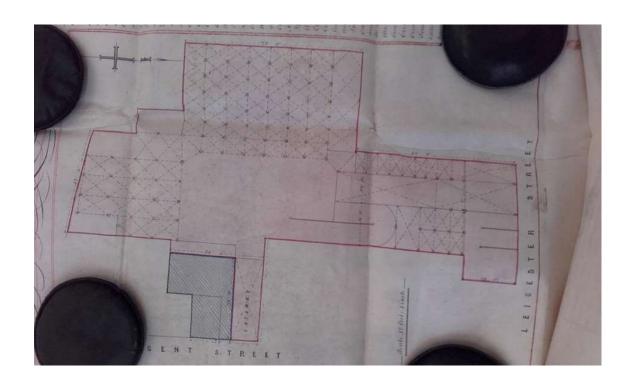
Ground floor plan of 121A Regent Street, 1879. Westminster City Archives.
